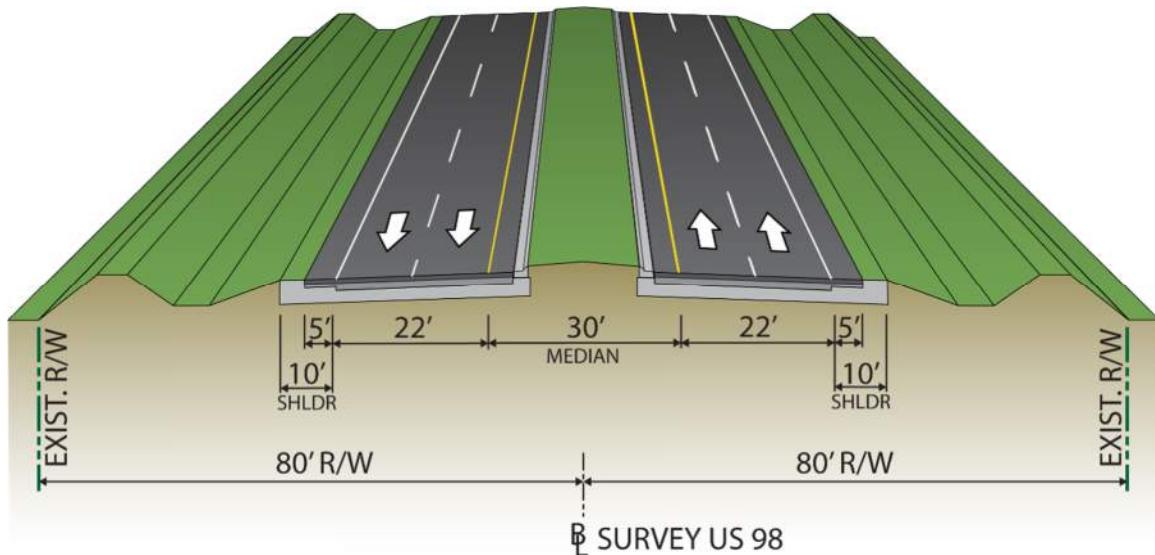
Proposed US 98 C3R (Suburban) Typical Section
